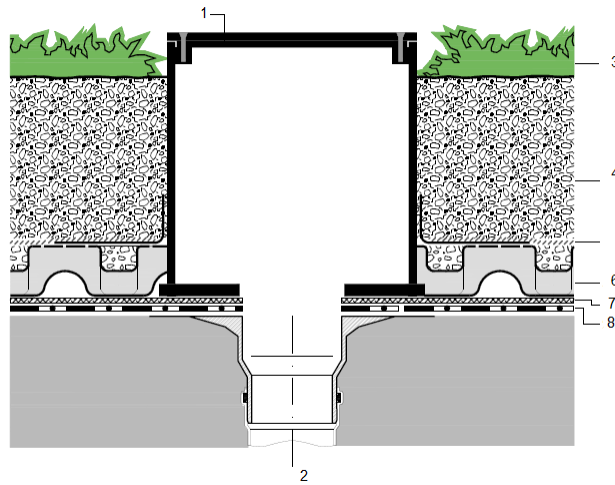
1. Inspection Chamber /drainage box.2. Roof outlet.3. Lawn, perennials, shrubs and small trees.4. System Substrate .5. Filter Sheet .6. Drainage Element .7. Protection, Material .8. Roof construction with root-resistant waterproofing.
